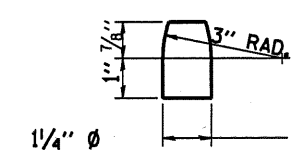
DETAIL OF ROCKER AT PIER 2 & ABUTS.
